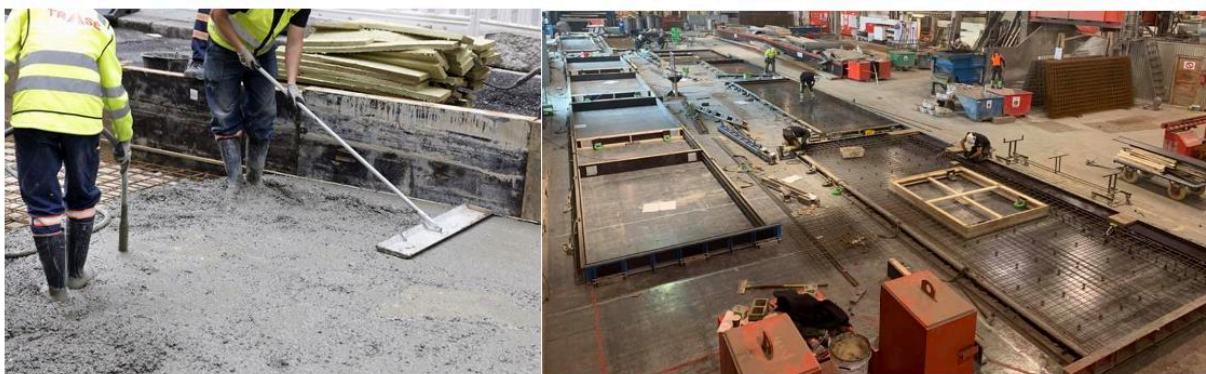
On-site-casting (left) (Teknisk Ukeblad, 2018) and pre-cast (right) (Overhalla Betongbygg, 2020)
